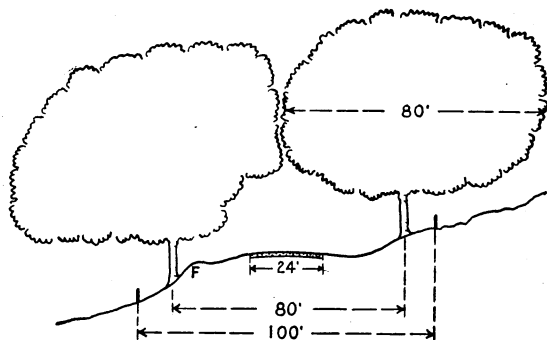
A 100-foot right of way with a 24-foot improved section and the trees placed 40 feet from the center line and the footpath (F) inside the trees. This distance apart permits even the larger shade trees to be planted opposite one another, although the branches at maturity would interlace
